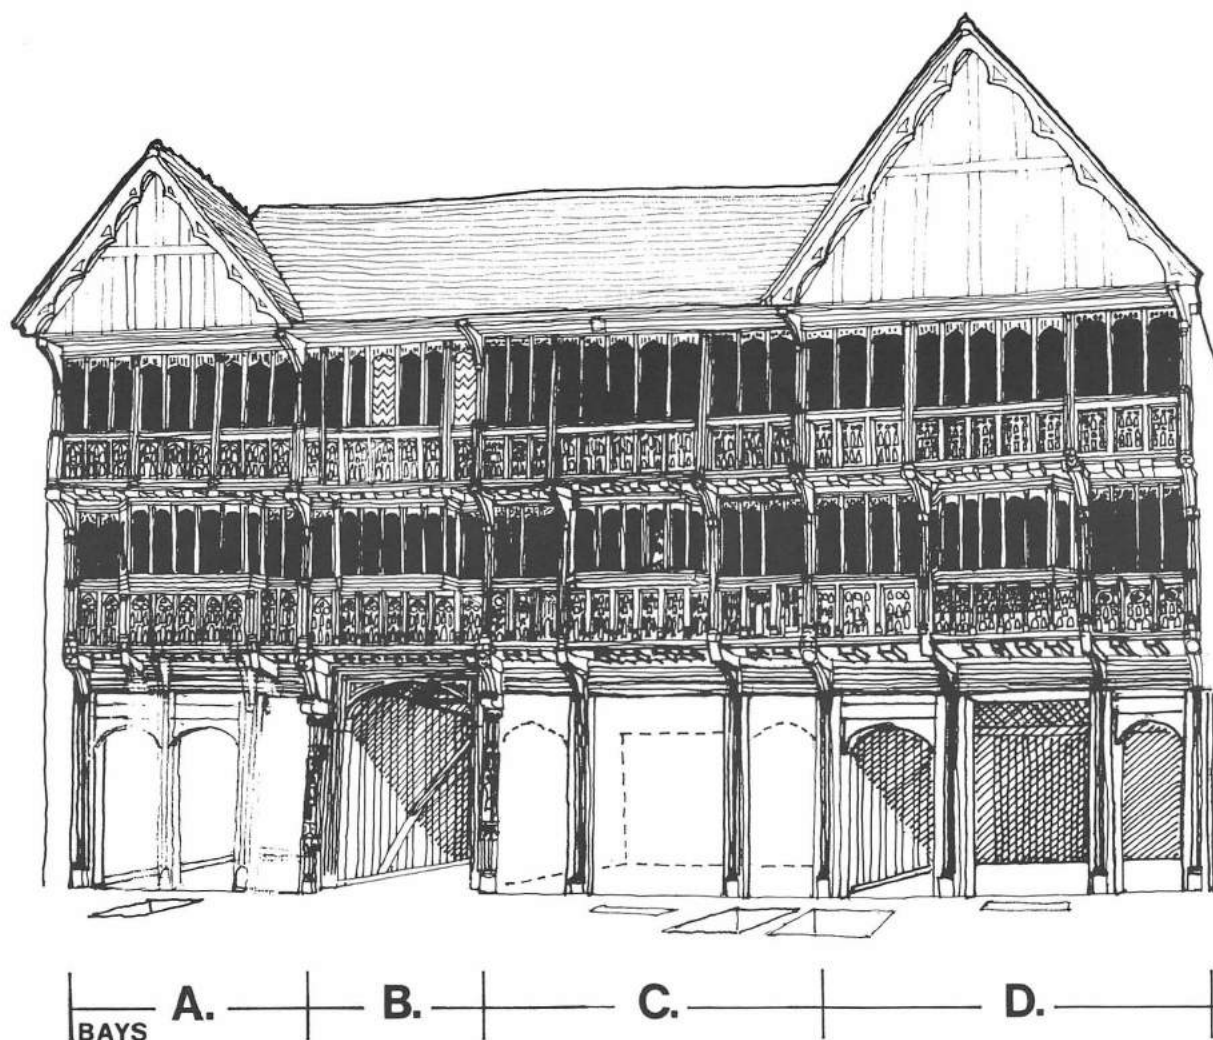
The Red Lion, Colchester. Reconstruction of street frontage elevation.
